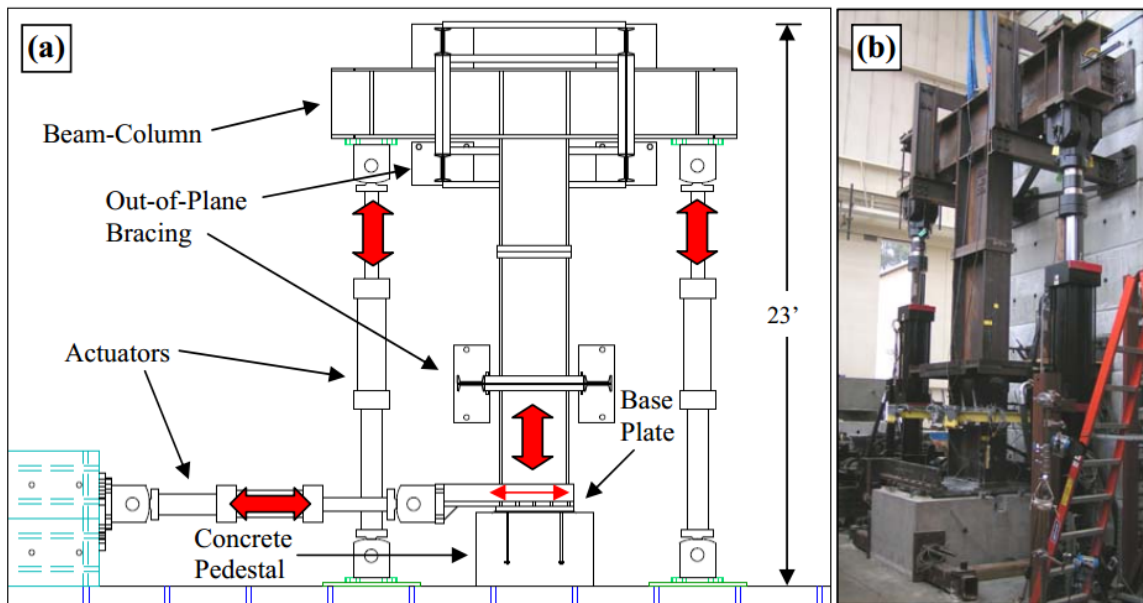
Base plate shear test setup (a) schematic and (b) photograph
